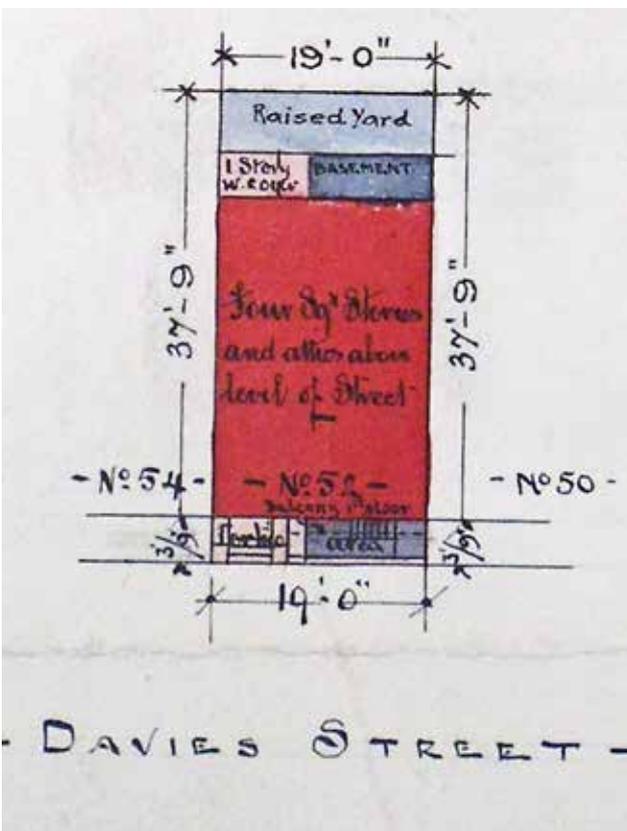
Lease plan of 52 Davies Street showing single storey closet wing extension (Grosvenor Archive).
